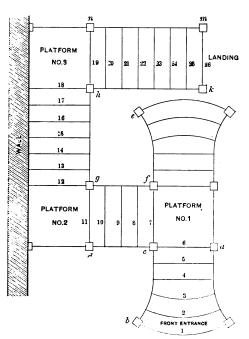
Plan of Stairs, Showing Various Platforms.
